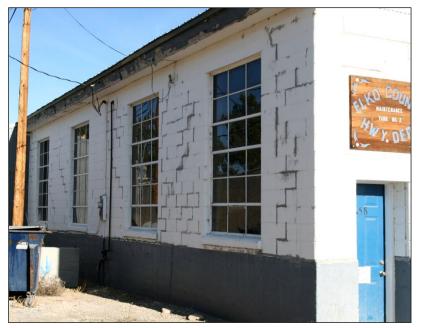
Southern side of the same building shown in figure 39, also showing patched cracks.
